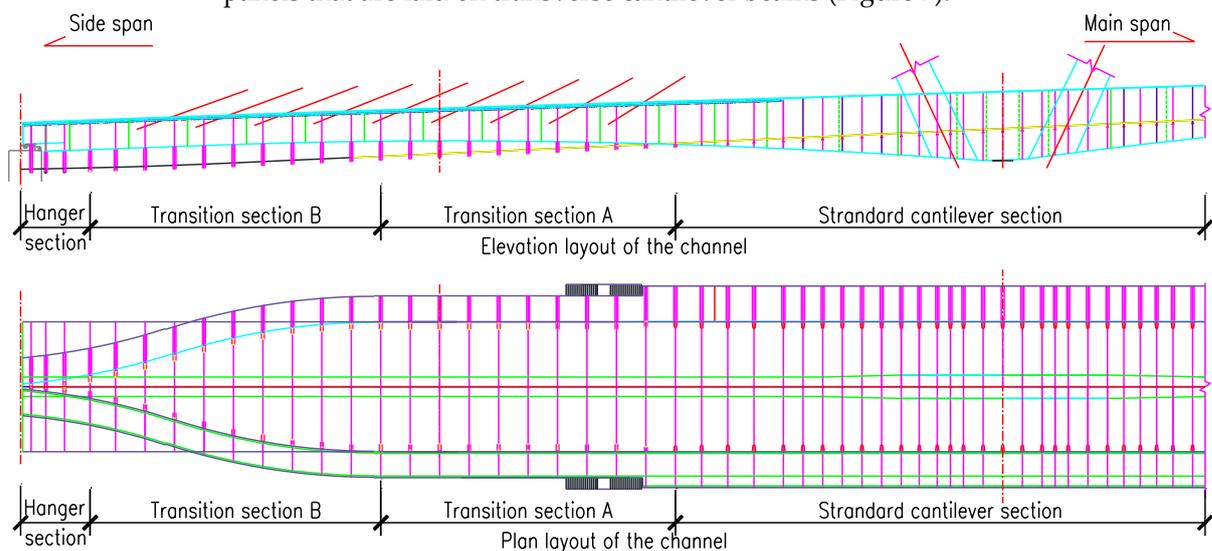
Elevation and plan of the pedestrian/bicycle channel of the Zhongxing Bridge
